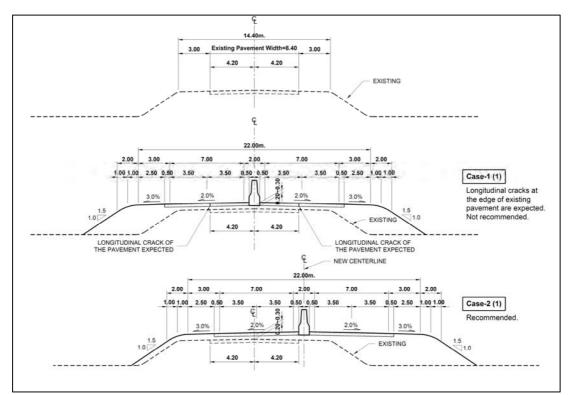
TYPICAL CROSS SECTION PATTERN-1: EXISTING PAVEMENT WIDTH=8.40M.
